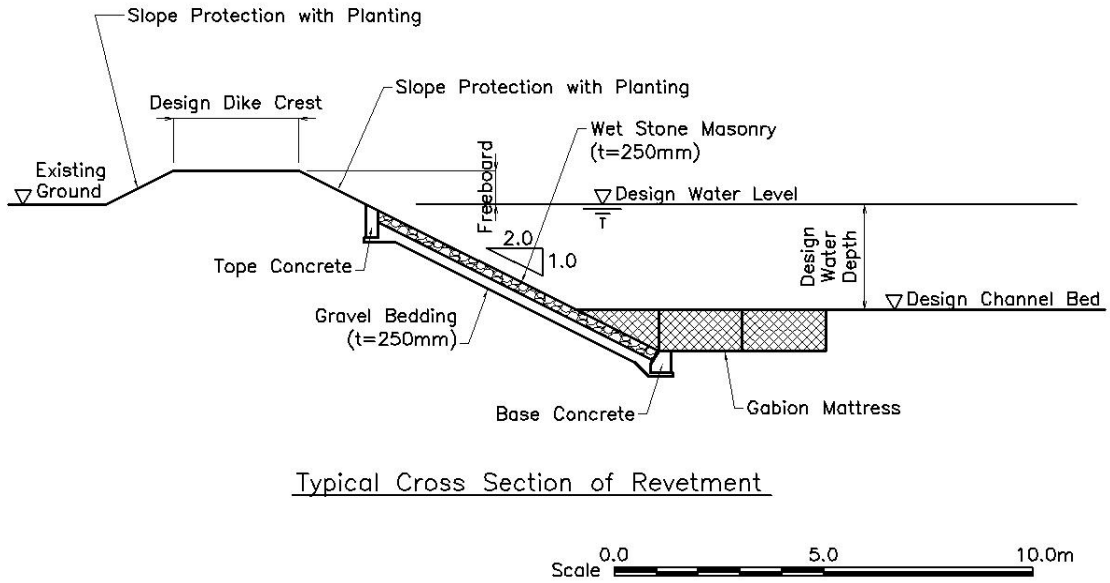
Proposed Arrangement of River Restoration and Improvement Plan
